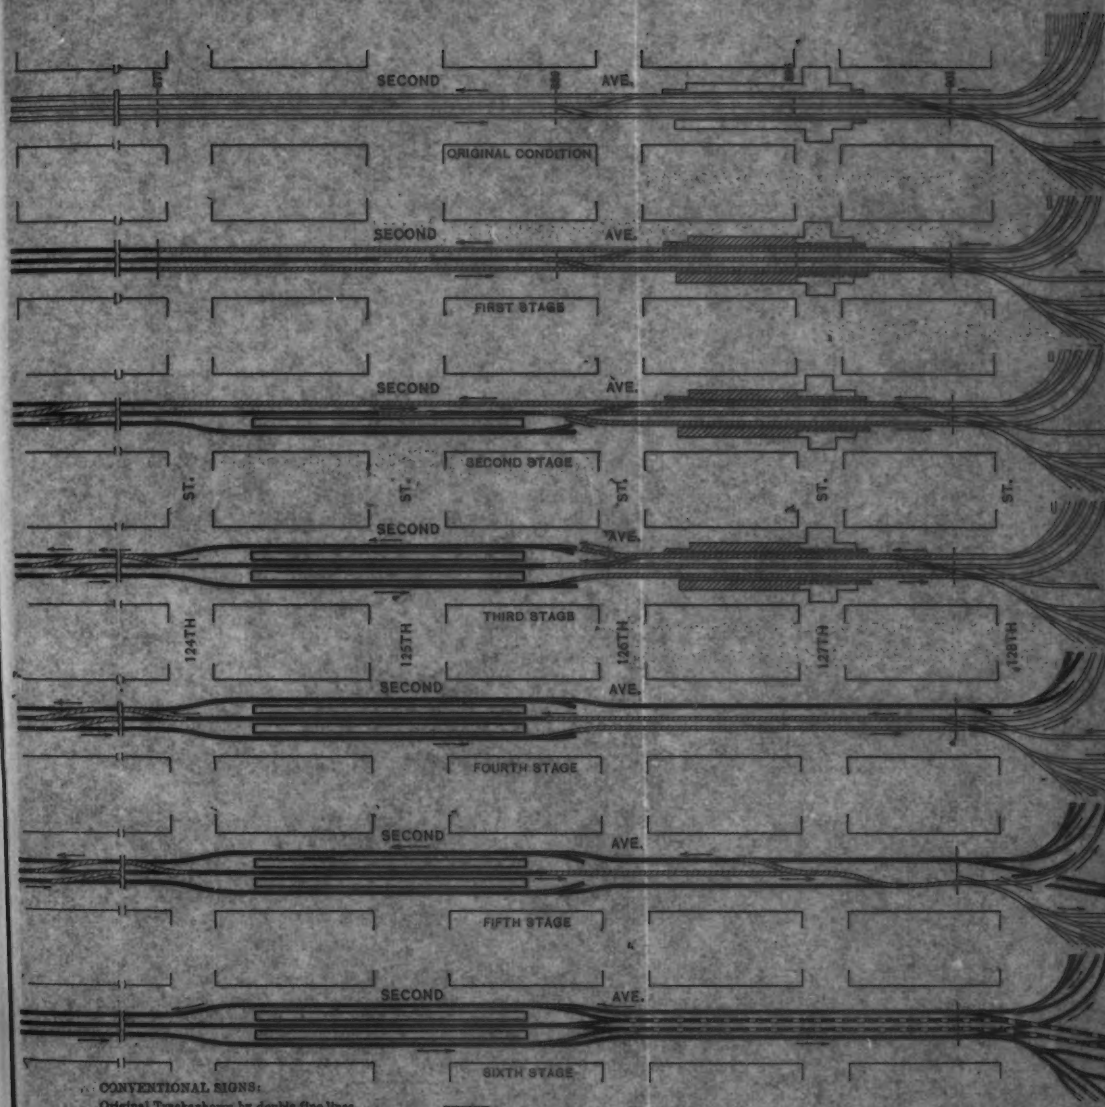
SECOND AVENUE LINE, NORTH OF 125TH STREET.
